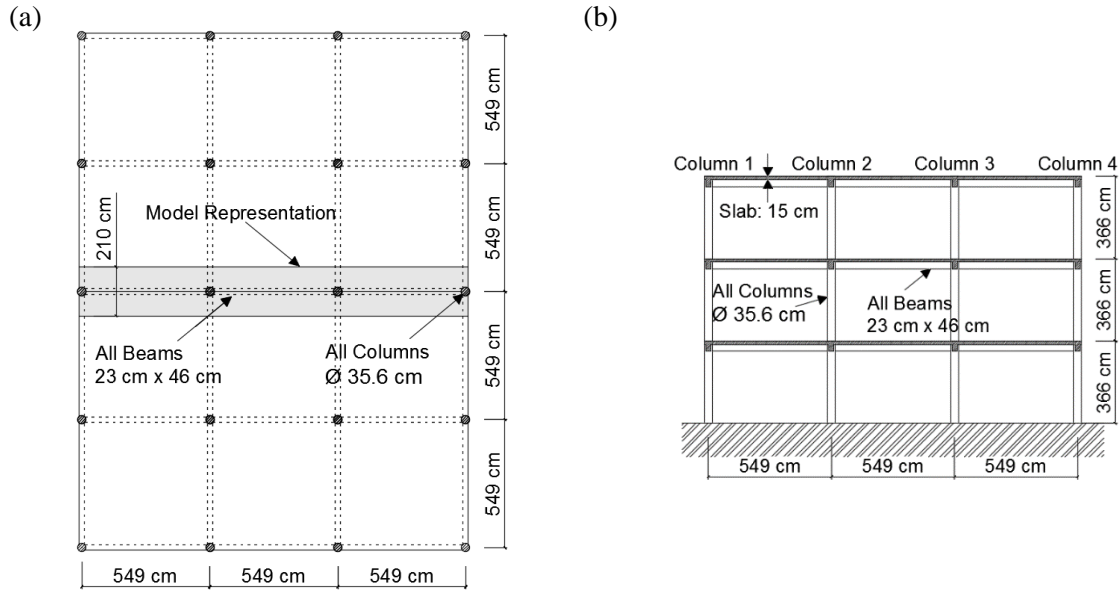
Reference structure's (a) plan and (b) elevation view.
